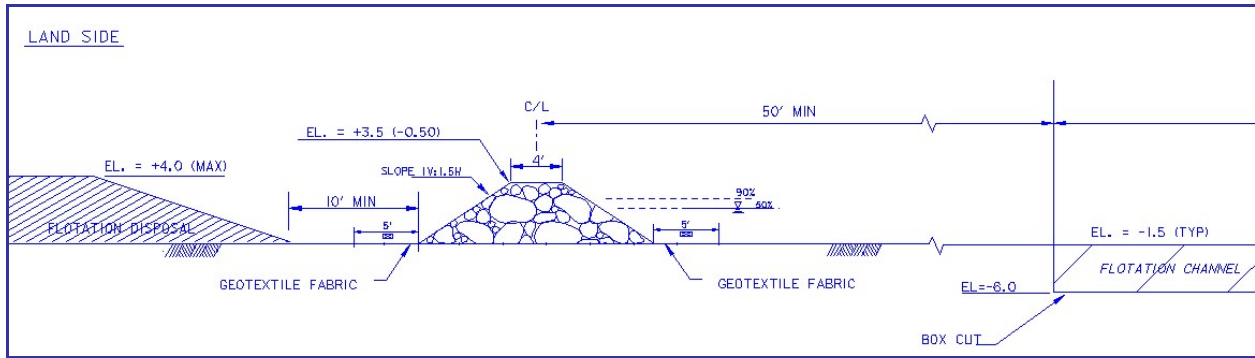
Typical Dike Layout with Flotation Disposal (from ME-22)
